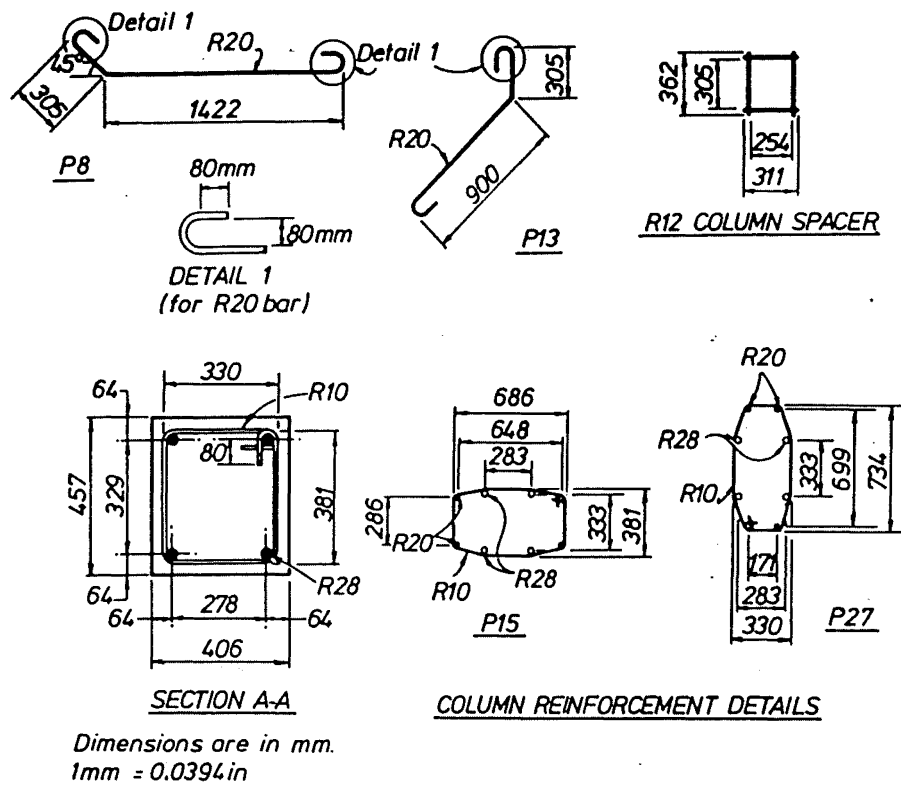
Details of column/crossbeam test specimen and reinforcing [Park et al 1993].
